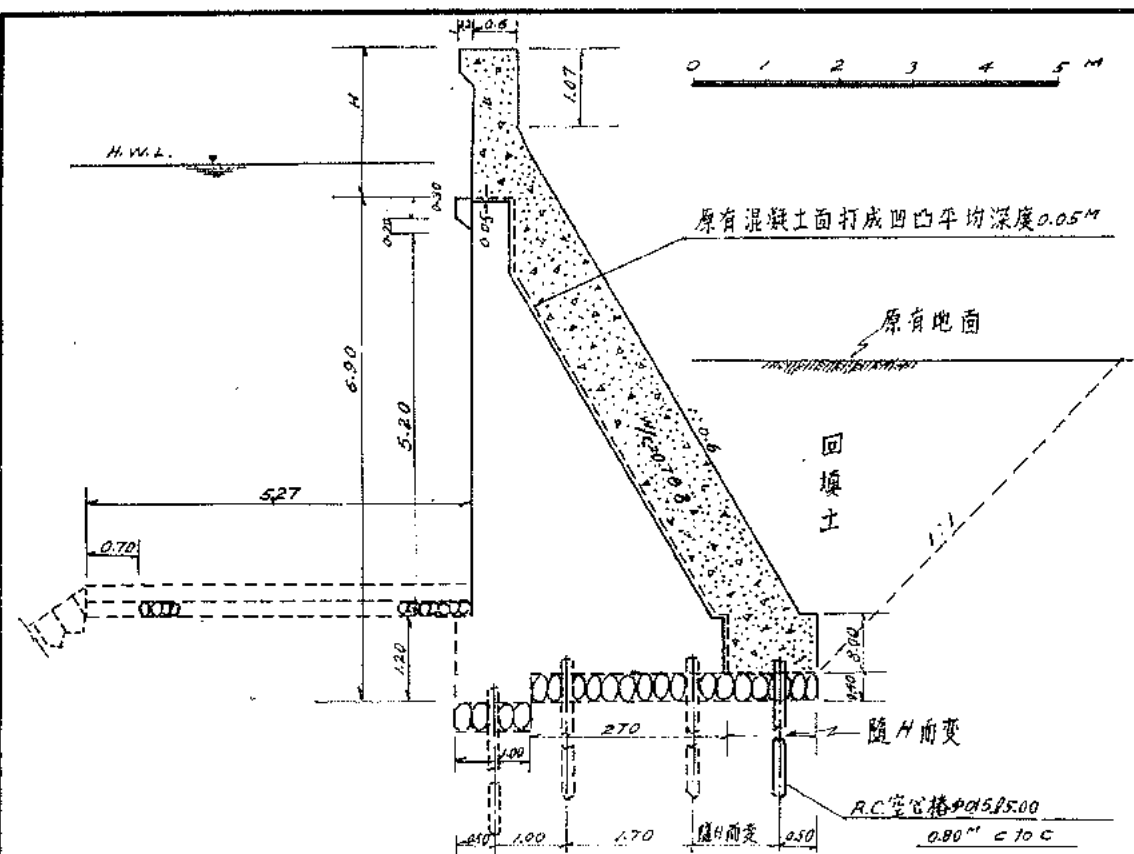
TYPICAL SECTION OF STONE LEVEE
